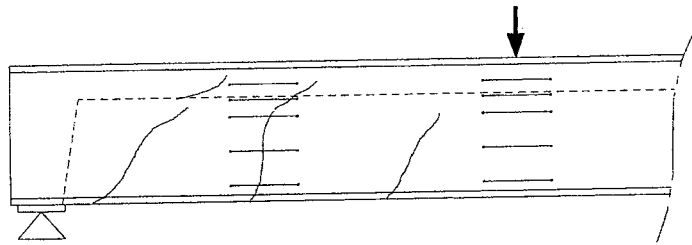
Concrete Cracks on the Exterior Face of the Loaded Leg with FRP Shear Strengthening (*Girder 2 West*)
